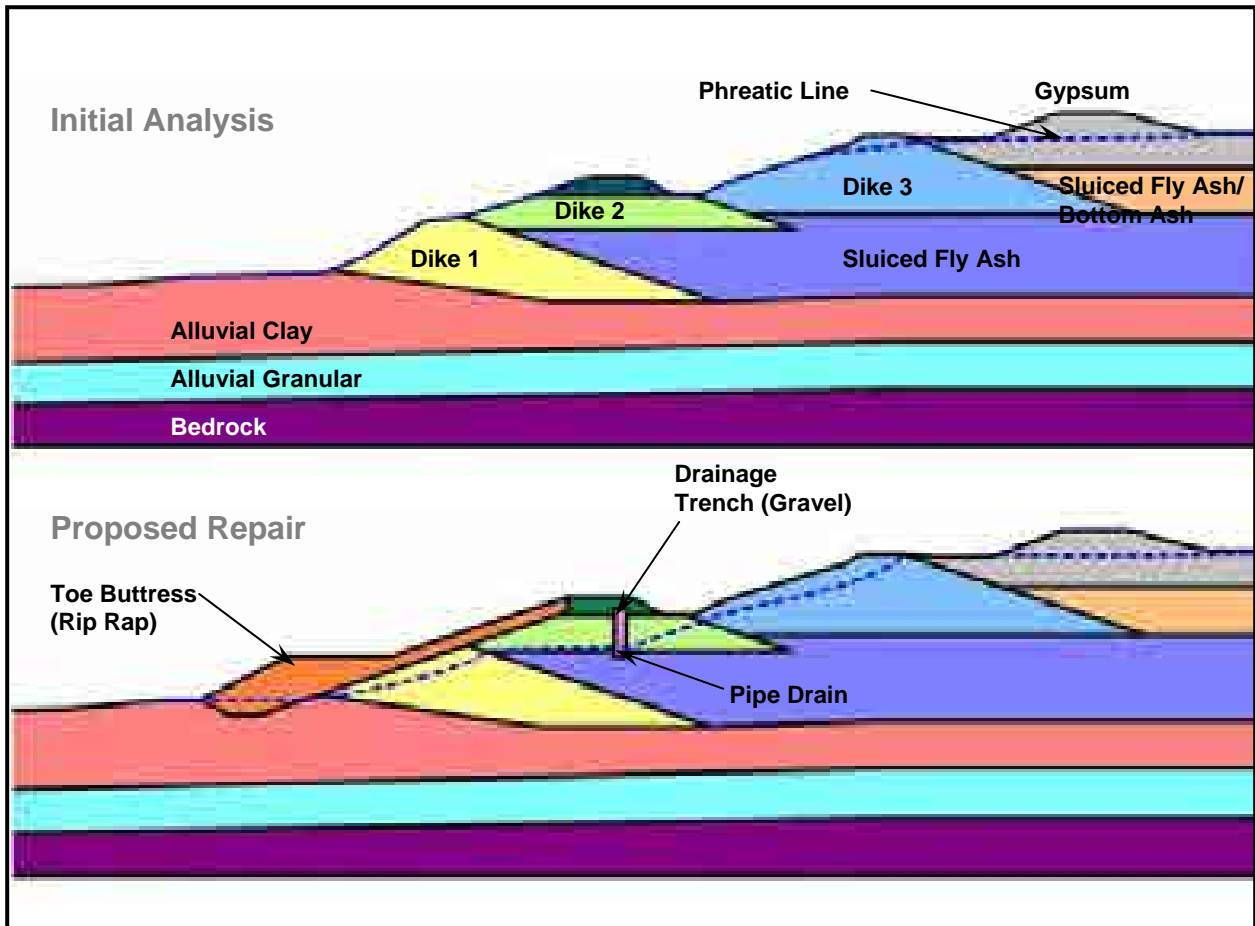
Section H (Existing Layout and Proposed Repair, Assuming Active Sluicing)
